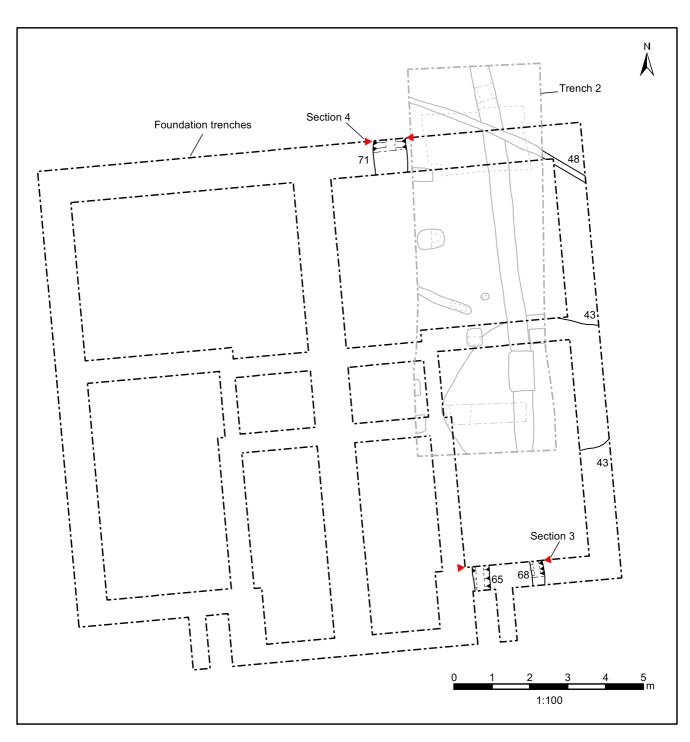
Plan of monitored foundation trenches of plots 3 & 4
